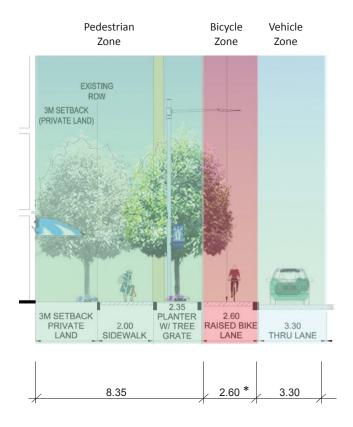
Gateway Demonstration Plan - Highway 7 and Creditstone Road
